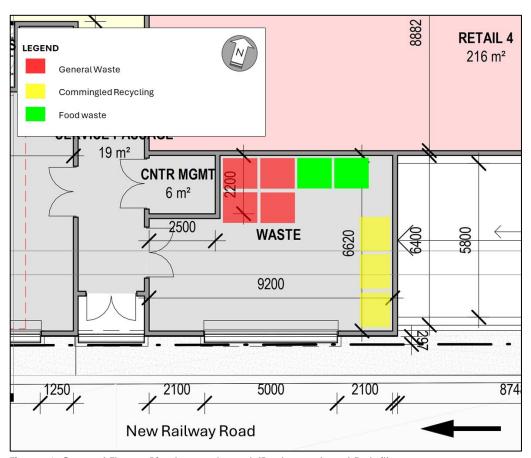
Ground Floor – Bin storage layout (Restaurant and Retail)
